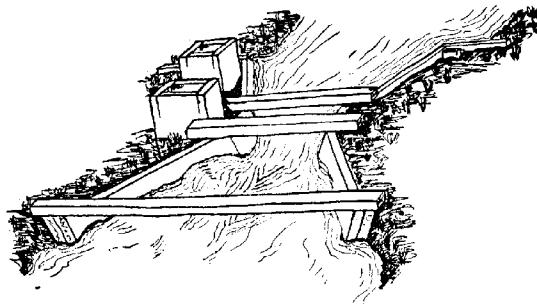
Sketch of the Venturi flume, showing installation in ditch.
